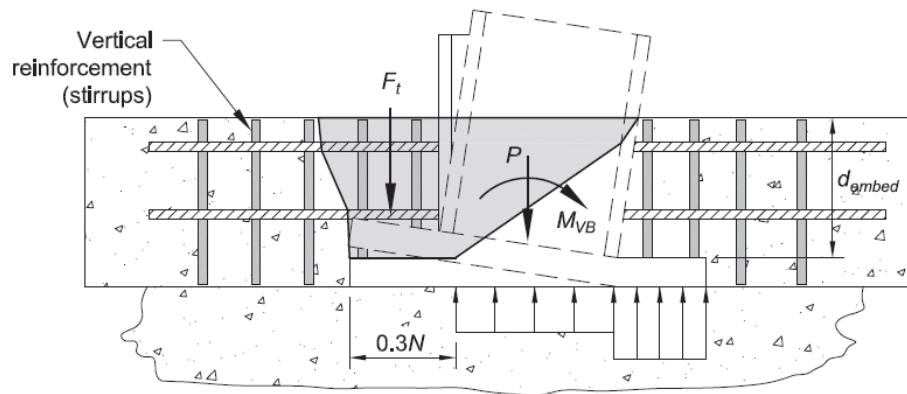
Breakout force of concrete above the tension side of the connection.
